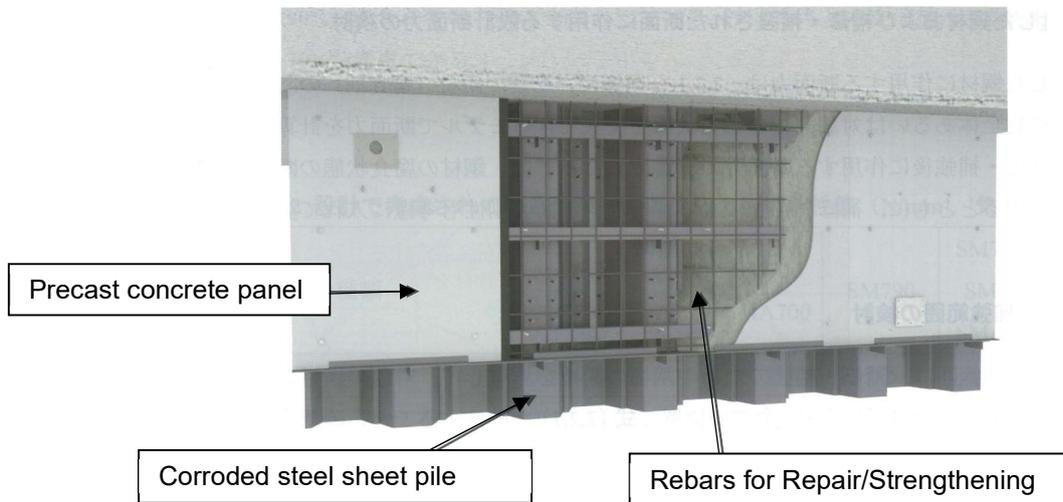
Example of repair and reinforcement of steel sheet piles using PCa panels as permanent formwork
